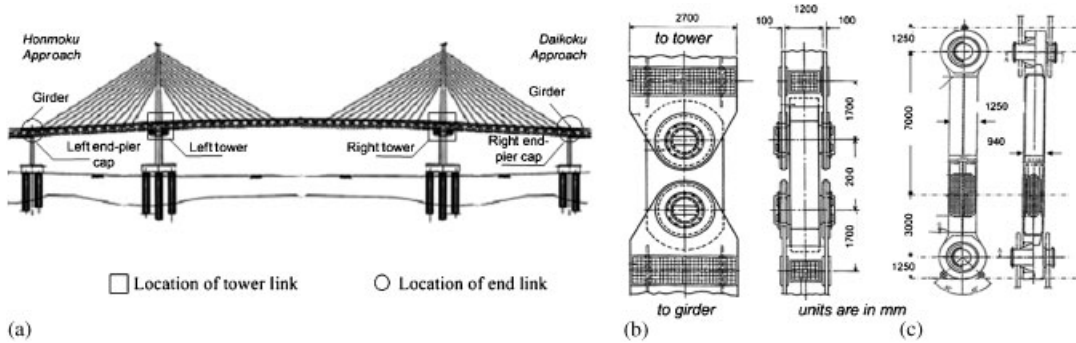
(a) Location of link-bearing connection of Yokohama Bay Bridge; (b) typical LBC at the tower; and (c) typical LBC at end piers.
